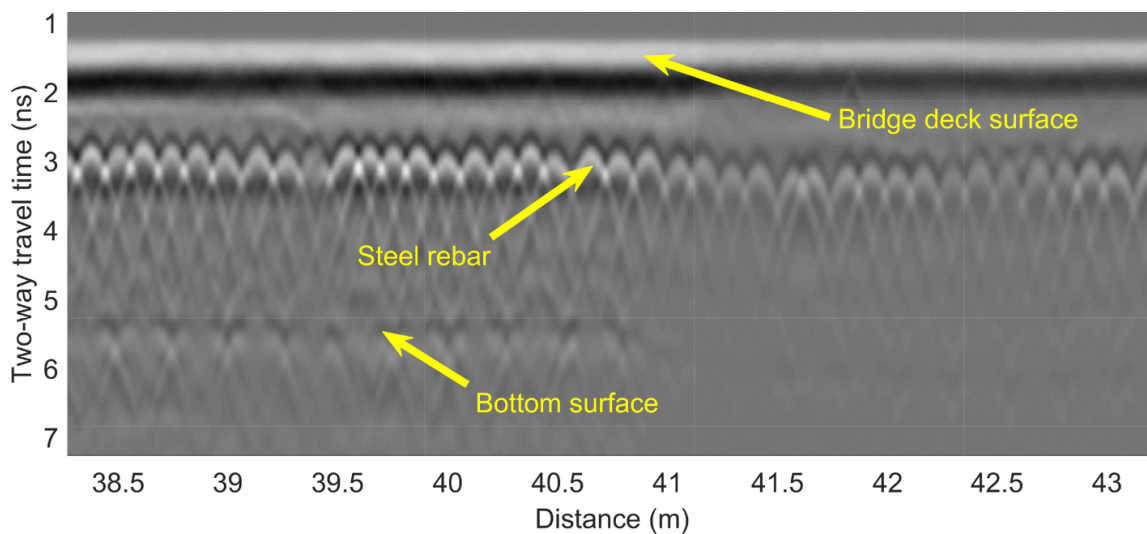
GPR Image of a Concrete Bridge Deck [20]
